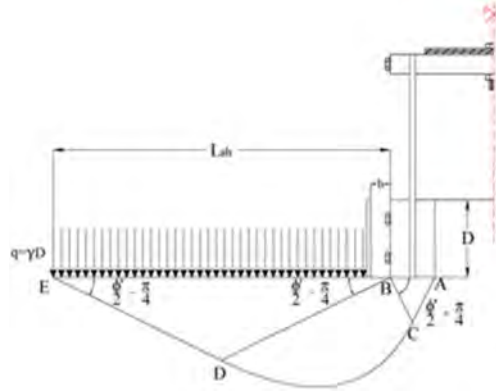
Potential global collapse mechanism for a shallow foundation with lateral disconnection.
